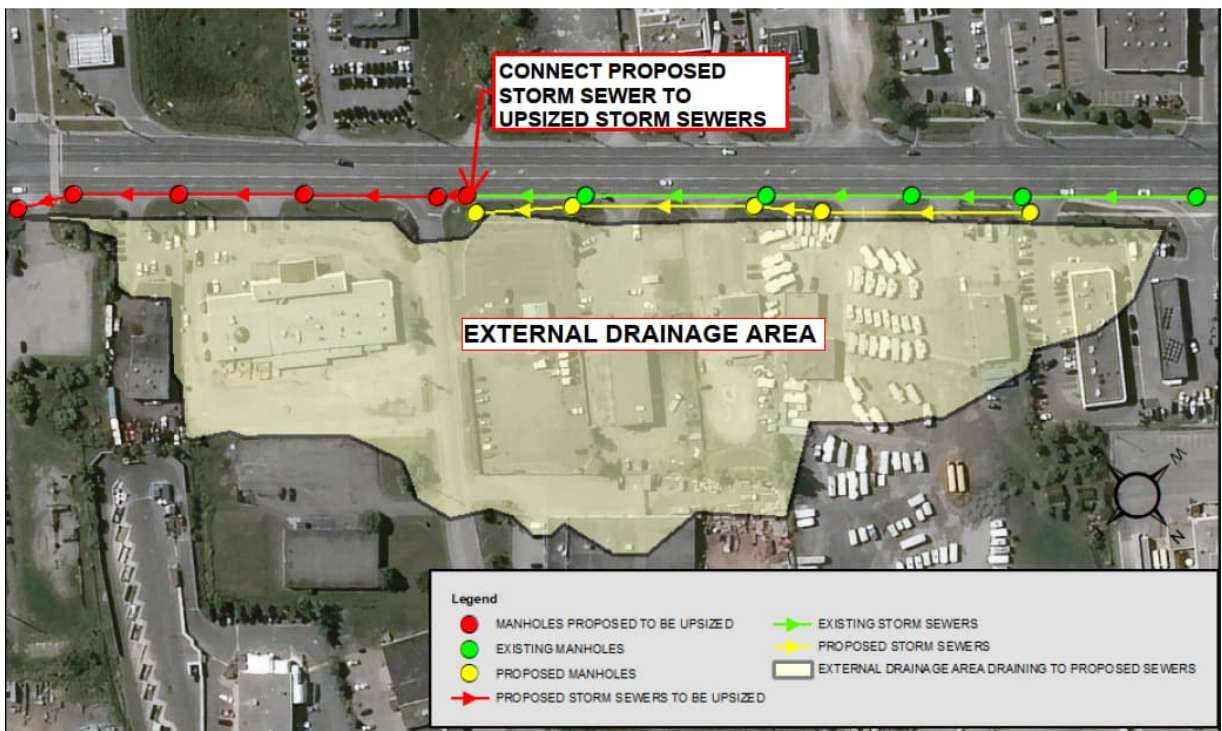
External Drainage Area & Proposed Storm Sewer System (North of - Highway 50 & George Bolton intersection)
